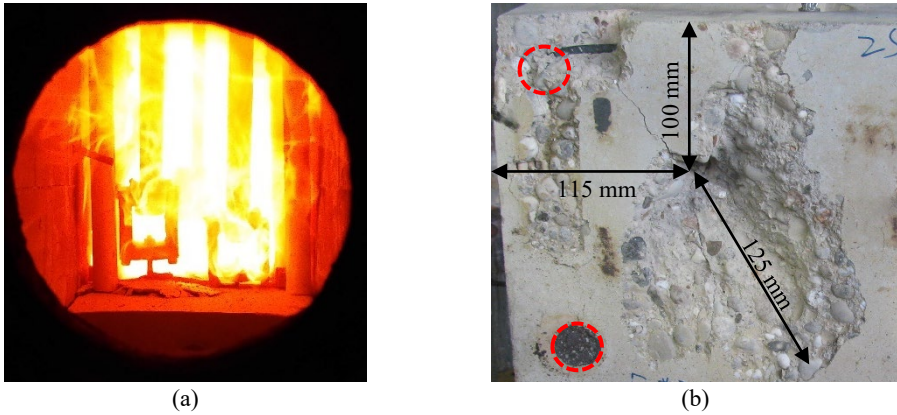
Typical failure mode for expansion anchor size M12 ( $h_{ef} = 70$  mm) (a) image during the fire test and (b) after the fire test.
